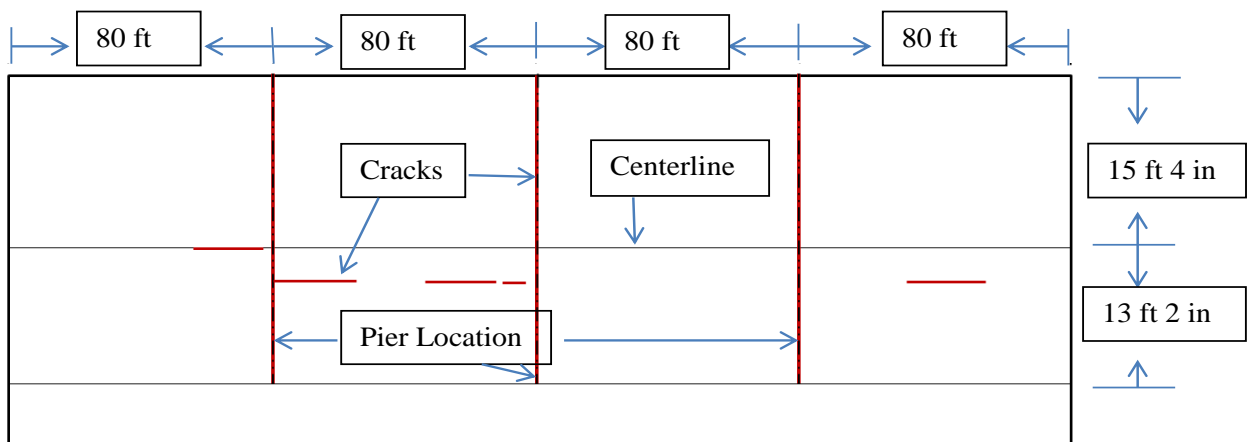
Approximate Locations of Longitudinal and Transverse Cracking in Plan View
